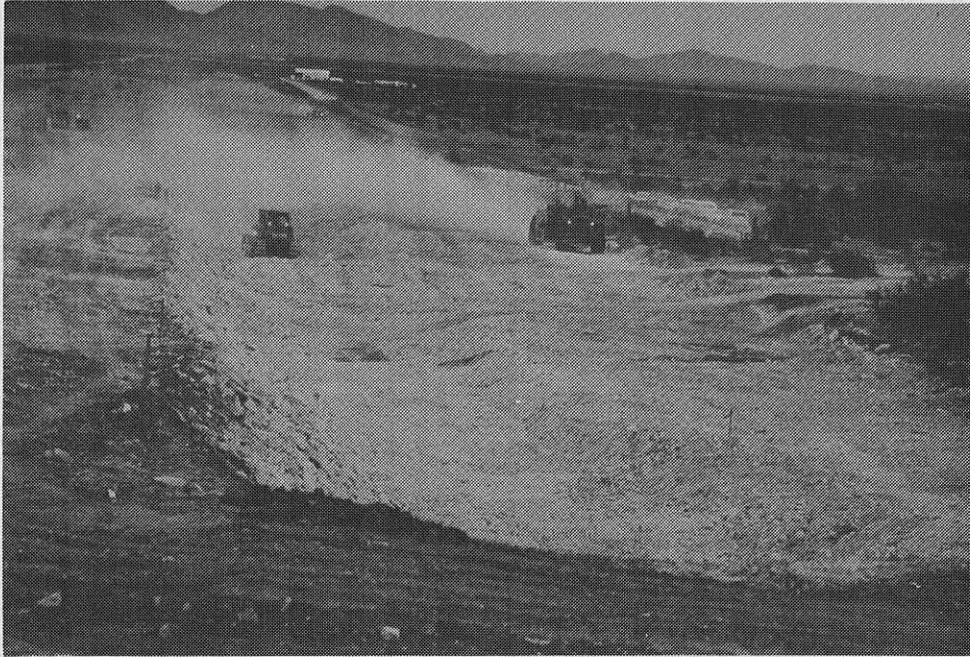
View of dike no.1 exploration trench excavation looking north from south abutment. January 1984
